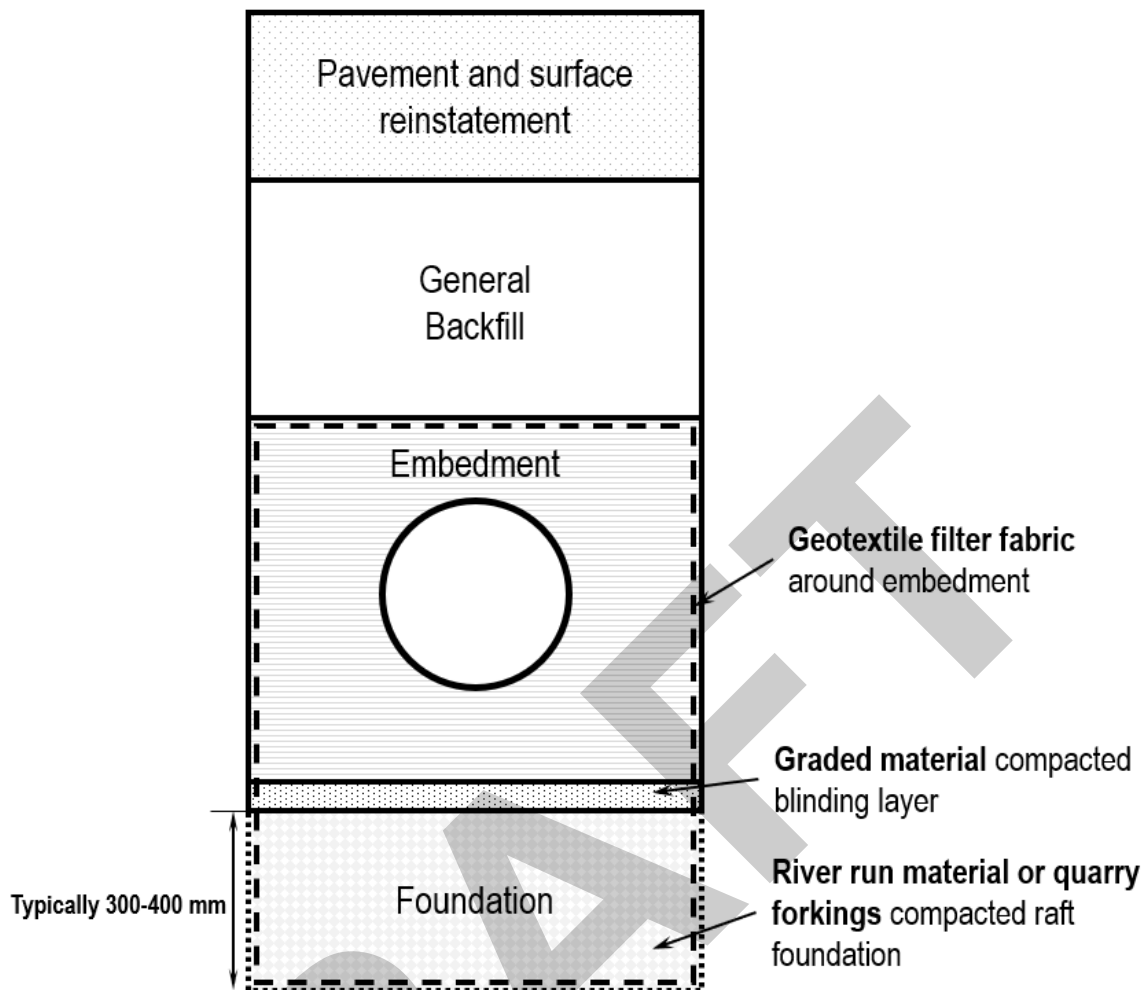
Typical trench arrangement where the site has a high groundwater table
